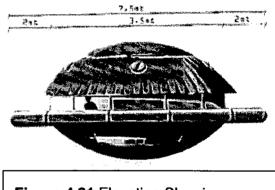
Elevation Showing Dimensions, Les Anthenea
